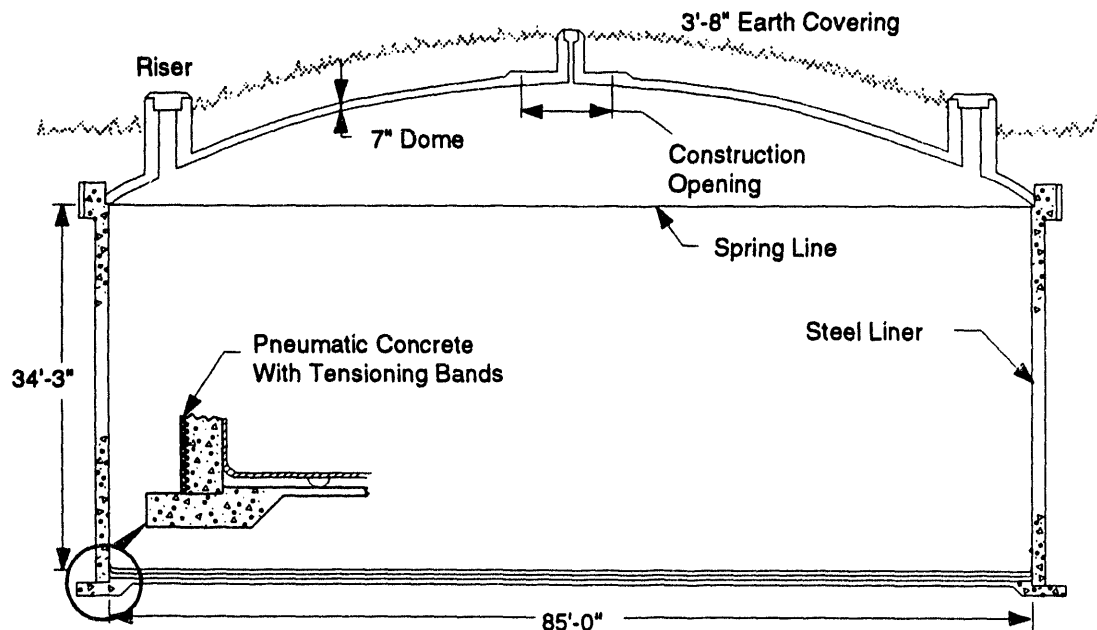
Uncooled Waste Storage Tank, Type IV (Prestressed Concrete Walls, 1,300,000 Gallons).
